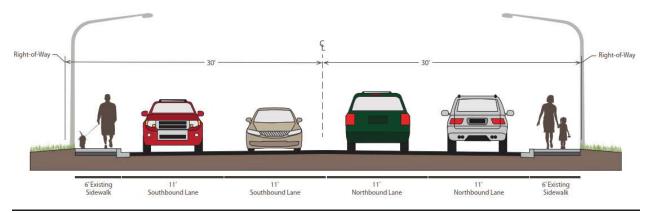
Proposed Typical Section – Burwell Street to 13th Street
